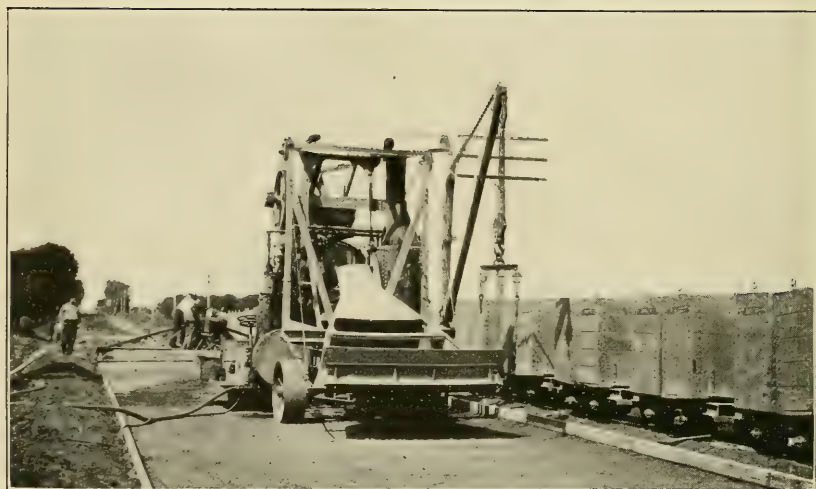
INDUSTRIAL RAILWAY HAULING PROPORTIONED BATCHES IN BOTTOM DUMP BOXES.
